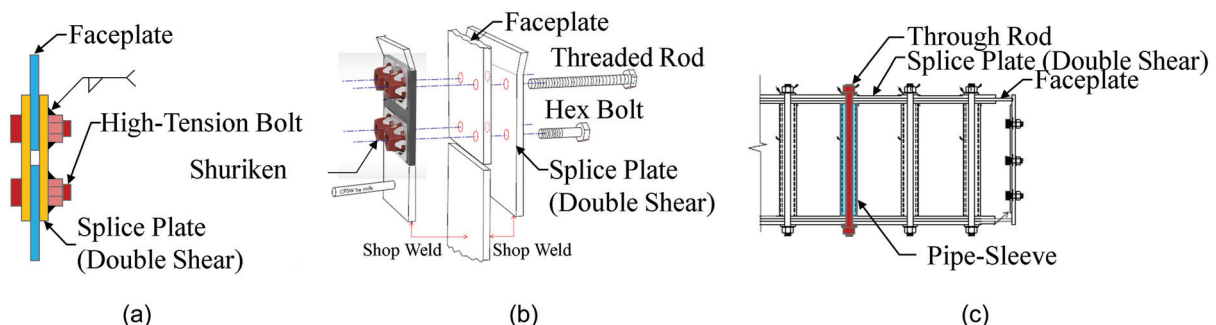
Different types of bolts: (a) prewelded nuts; (b) shuriken; and (c) through rod with pipe sleeve.
